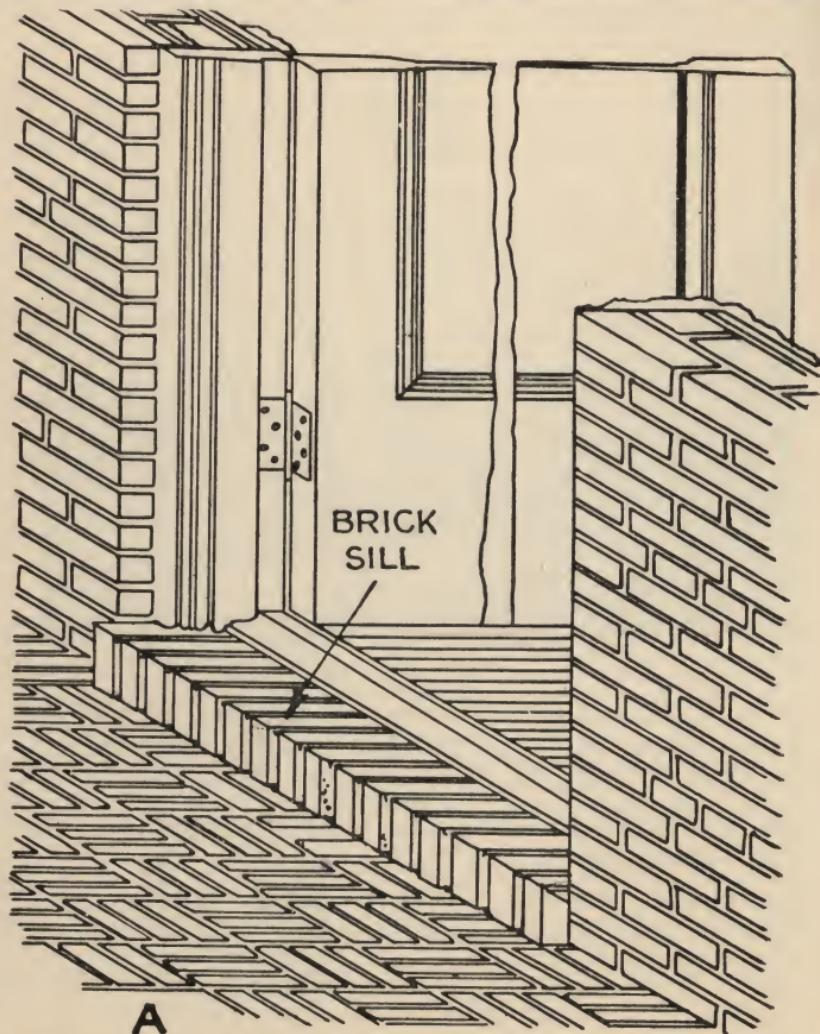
,296.—Exterior door opening with door and frame set, showing edge sill brick bringing frame up to second course level, also brick porch floor laid on edge.
